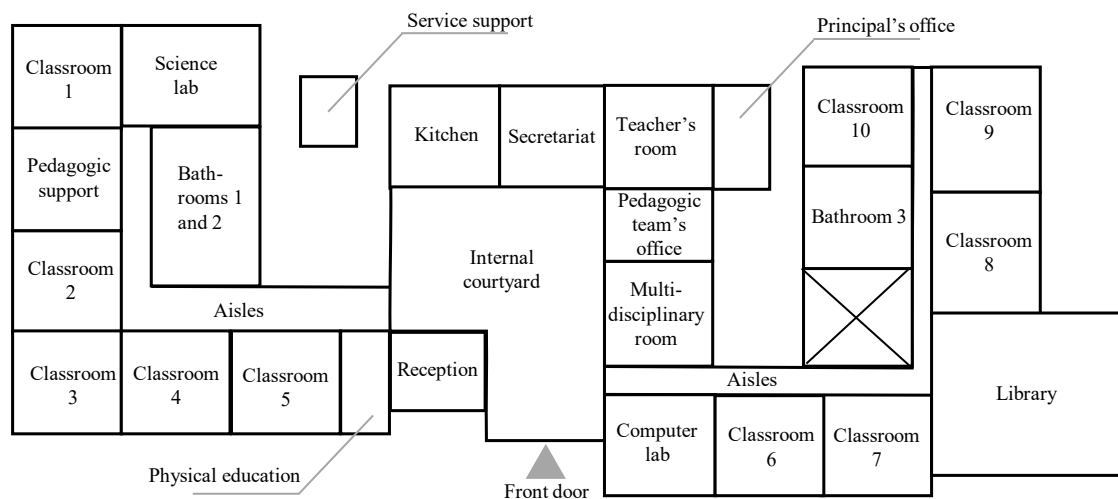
Schematic representation of the building floor-plan (no scale)
